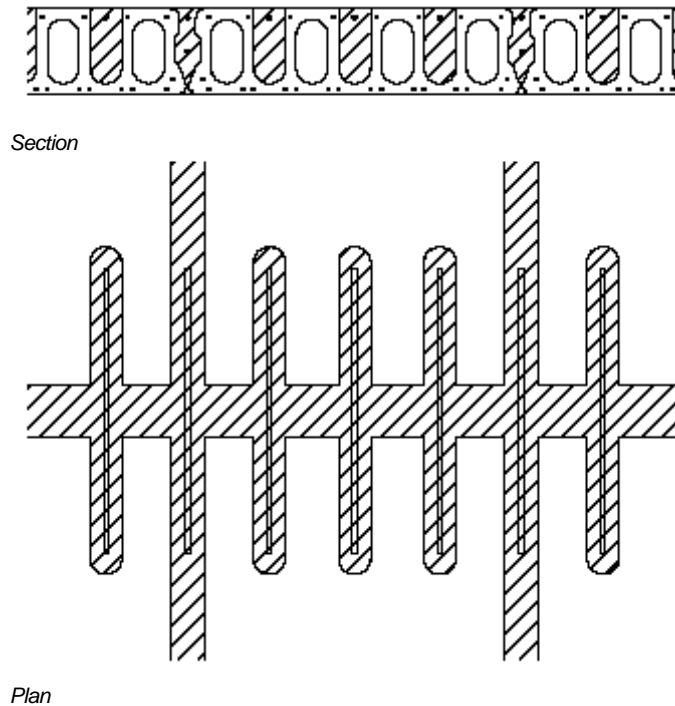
a Upper reinforcement in pre-stressed hollow core slabs
